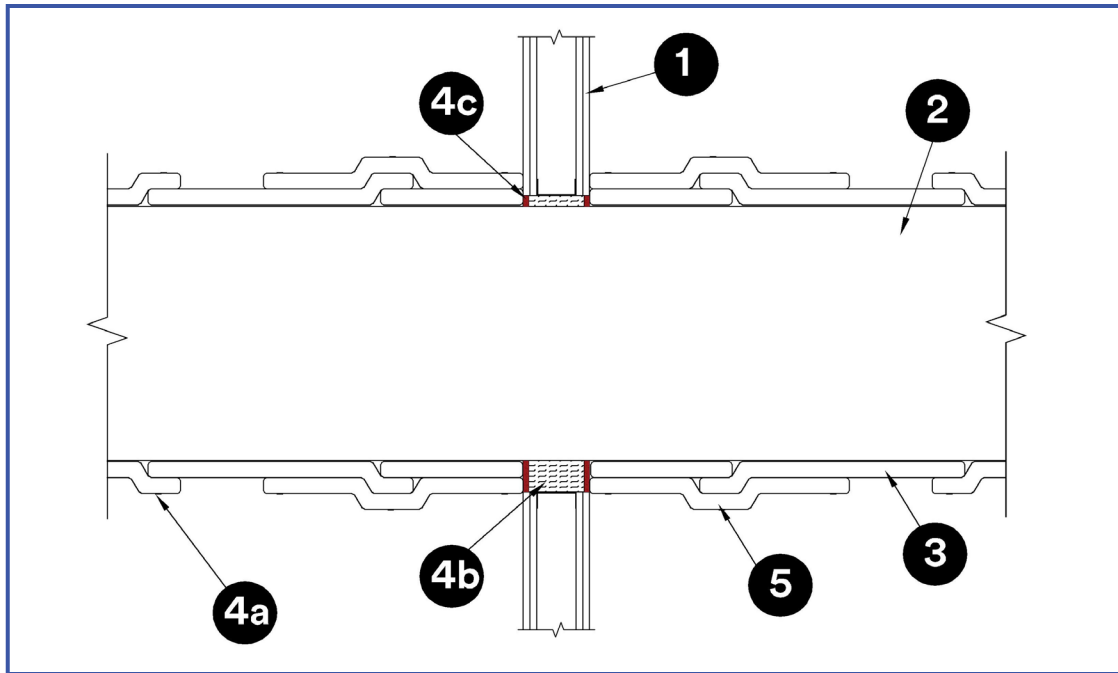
3M™ Fire Barrier Duct Wrap 615+ terminated at 1 or 2-hour fire-resistance rated gypsum wallboard assembly with symmetric collar (for ducts with dimension greater than 1525 mm or 60 in.)
